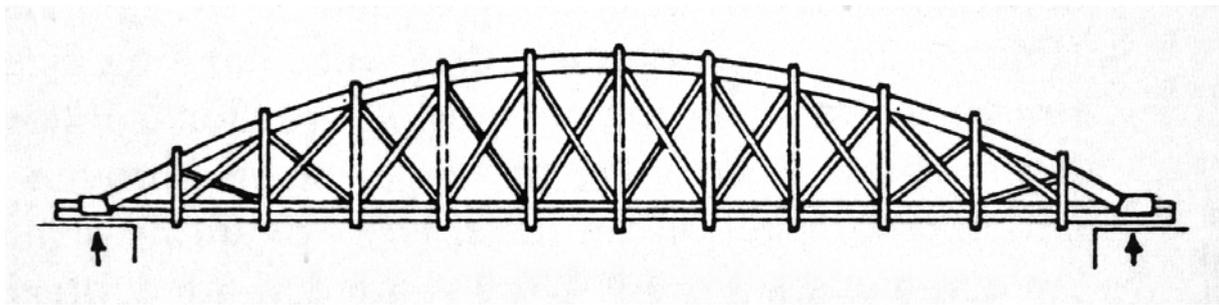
Tied-arch with cross-bracing, or bowstring truss. (James²)
